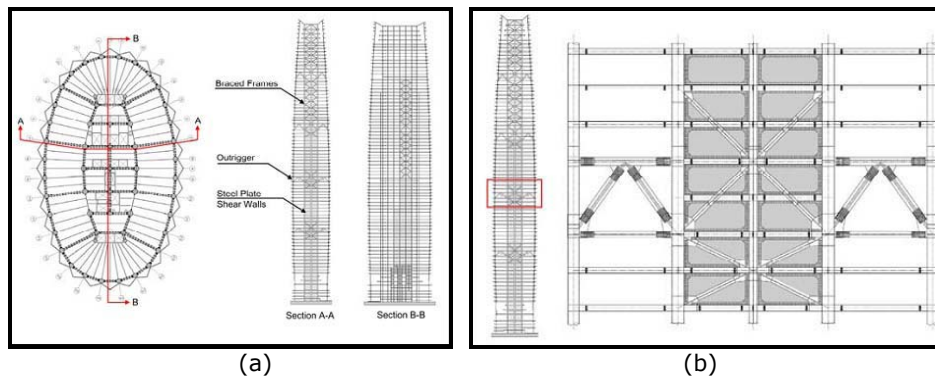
Typical plan and section a); Outrigger truss b)
